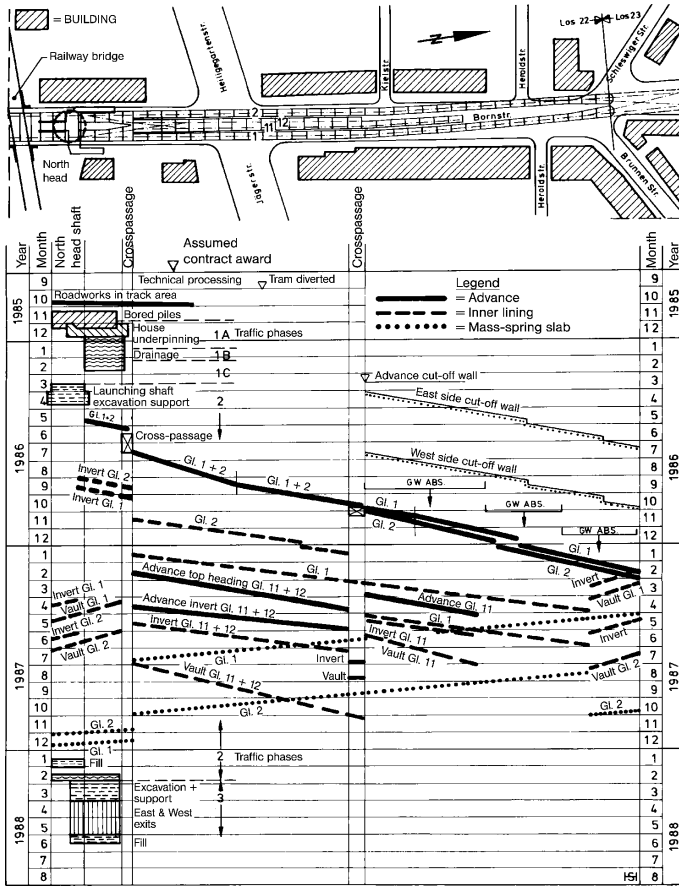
Construction schedule at the start of construction for the construction proposal, Stadtbahn Dortmund, contract 22.
